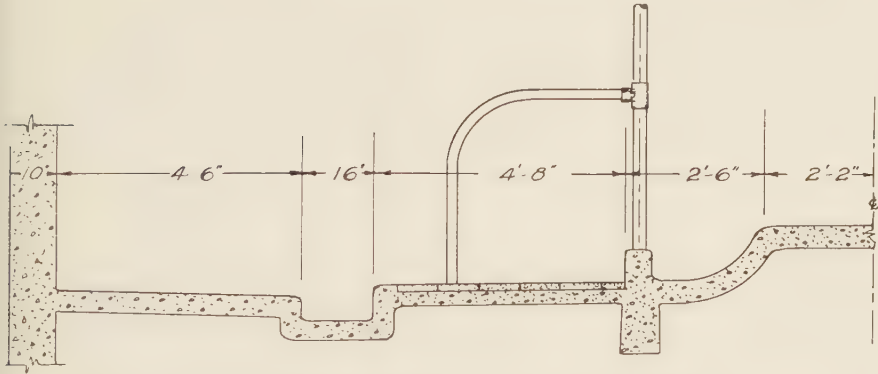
Cross section of a 32-foot barn with "face-in" arrangement.
